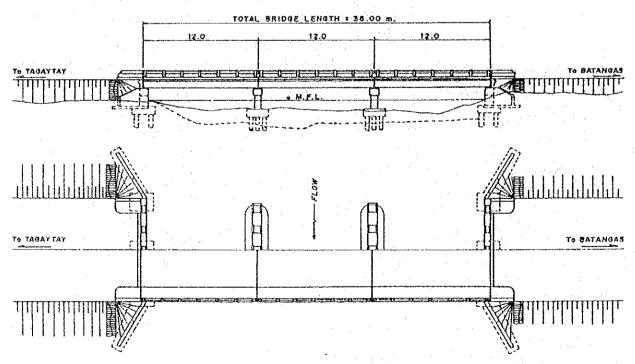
ELEVATION AND PLAN OF SINISIAN BRIDGE (BS-6) (Present and Original)
